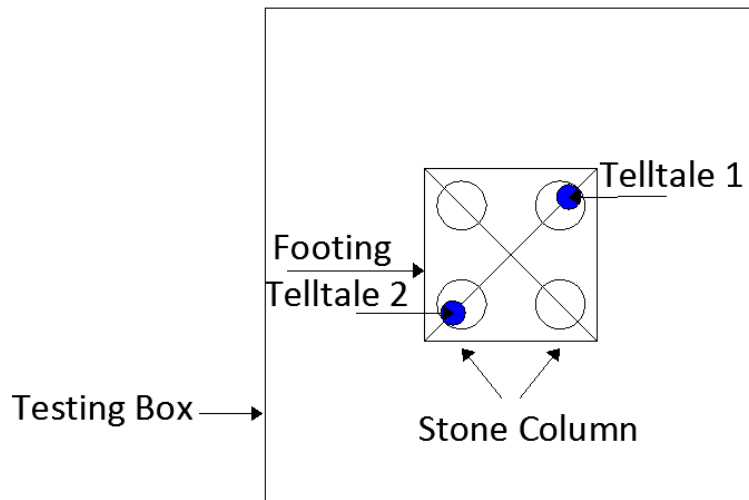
Plan view of telltales (TS1, TS2, TS3, TS4)
